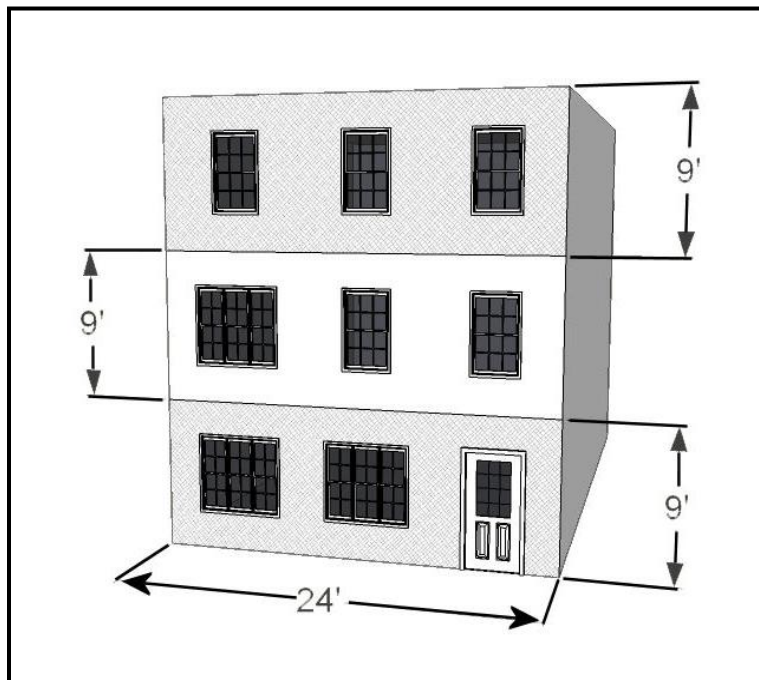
B. ILLUSTRATION OF THE WINDOW REQUIREMENT. EACH FLOOR HAS A FAÇADE AREA OF 216 SQUARE FEET AND REQUIRES 43.2 SQUARE FEET OF WINDOWS. THE FIRST FLOOR HAS 66 SQUARE FEET OF WINDOWS, MEETING THE MINIMUM REQUIREMENT. THE SECOND FLOOR HAS 46.5 SQUARE FEET OF WINDOWS, MEETING THE REQUIREMENT. THE THIRD FLOOR HAS 36 SQUARE FEET OF WINDOWS AND DOES NOT MEET THE REQUIREMENT.
